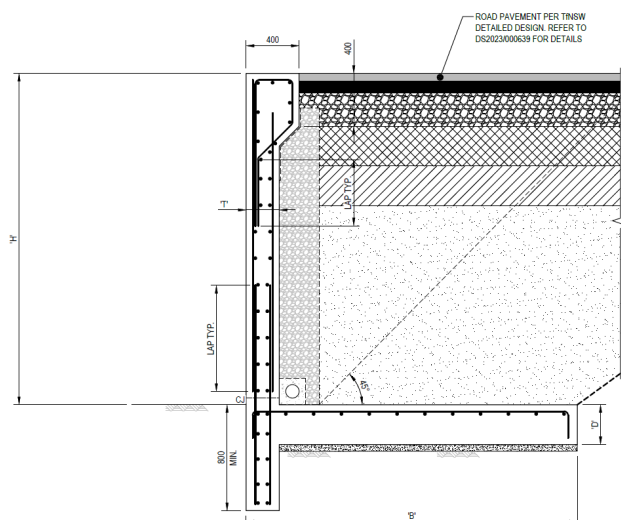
Typical cross section of a reinforced concrete retaining wall
